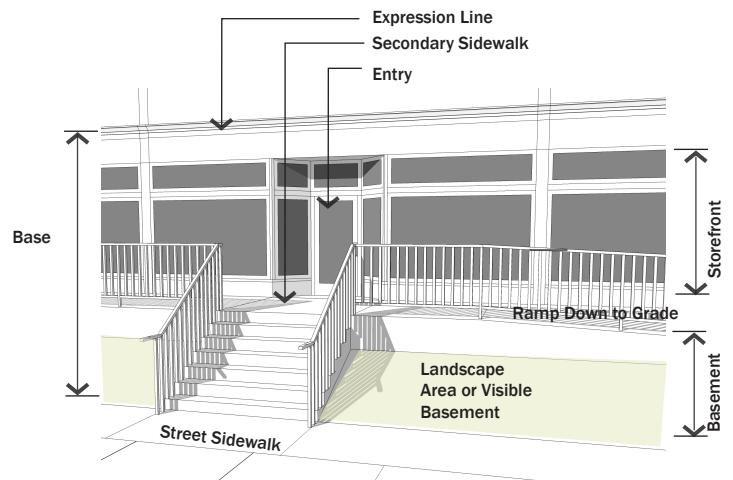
I (2). Elevated Storefront Entrance Type.
